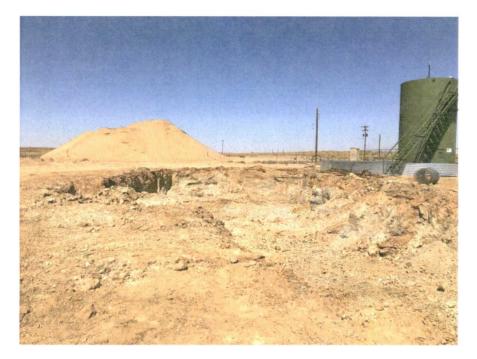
LACT excavation extension area. Photo taken August 13, 2018.
